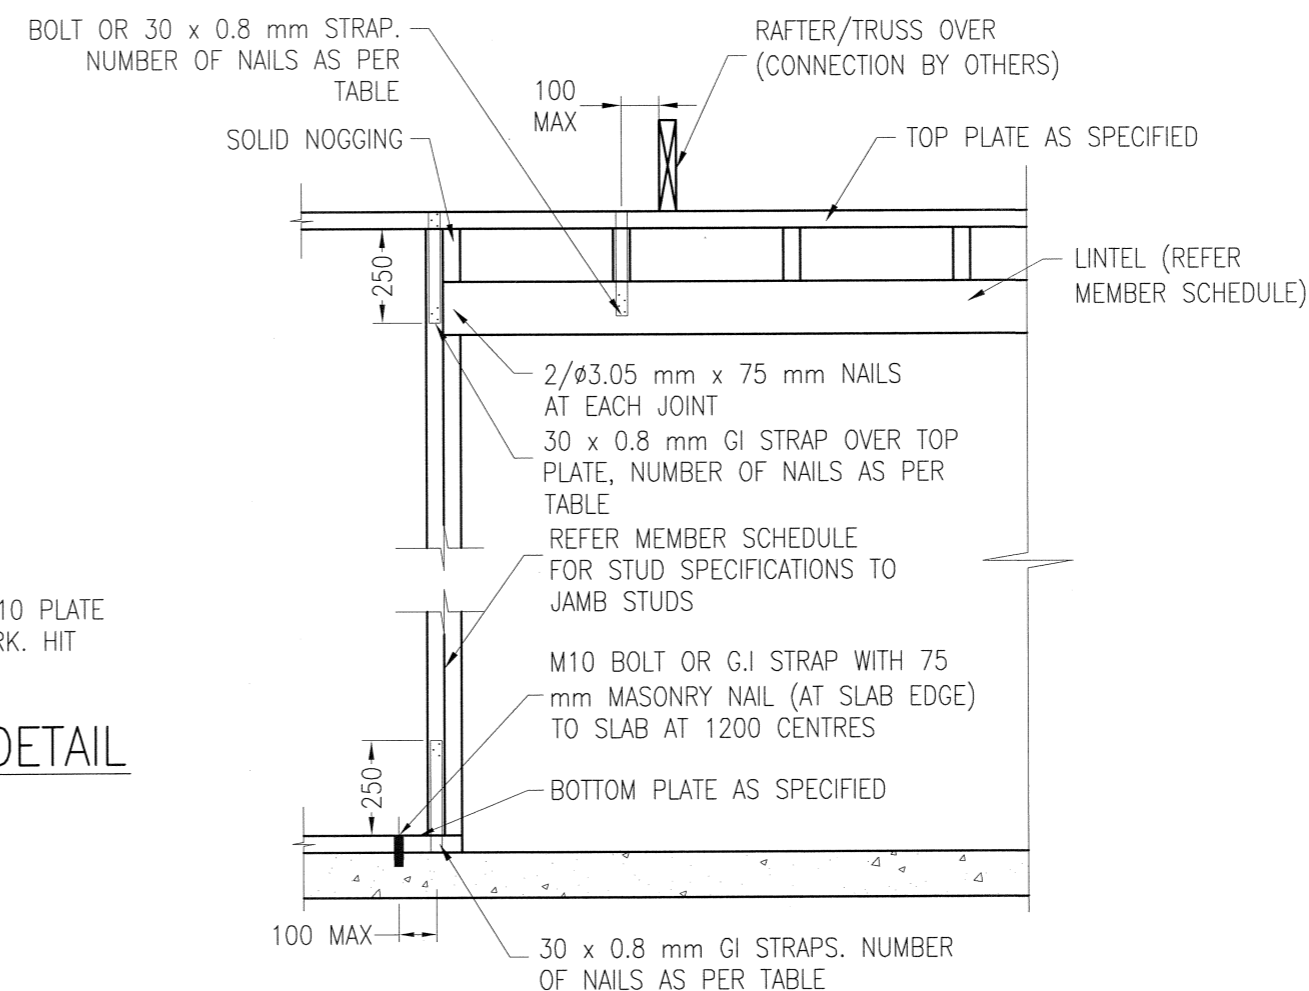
LINTEL L6 TO LINTEL L7 CONNECTION DETAIL
